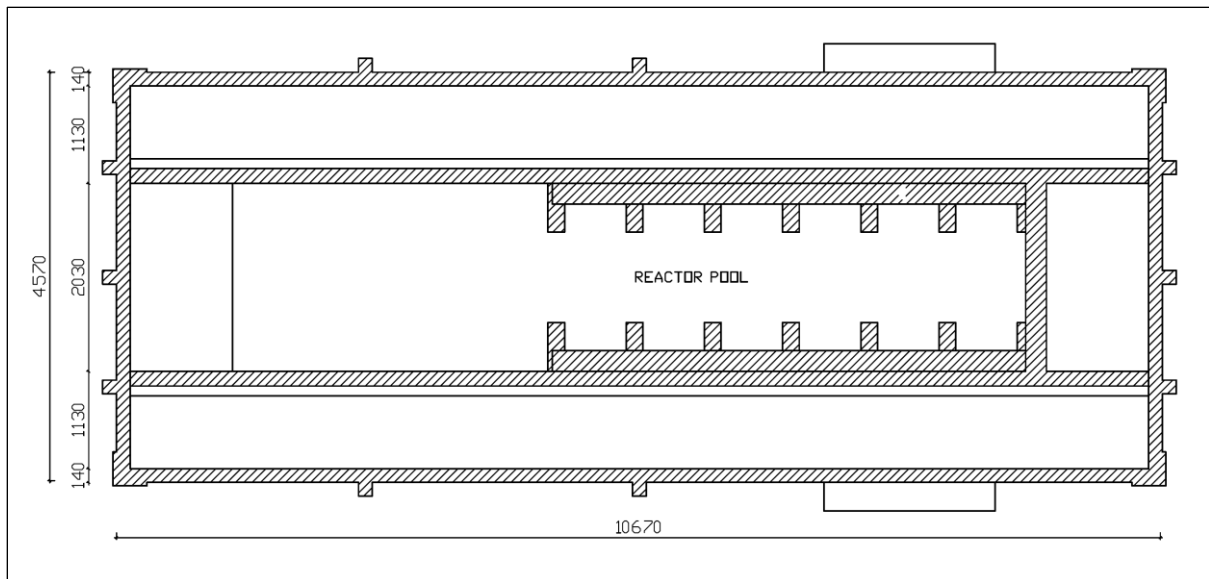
RXB Horizontal cross-section, not to scale, dimensions are in cm
